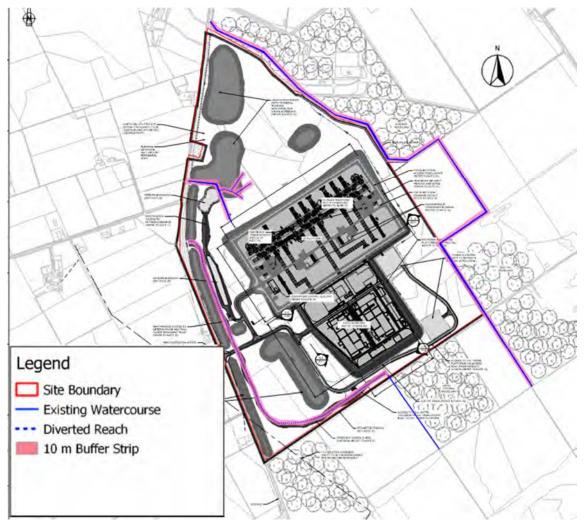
Location Plan Showing the Proposed Permanent Development Overlain with Watercourse Diversion Proposals.
